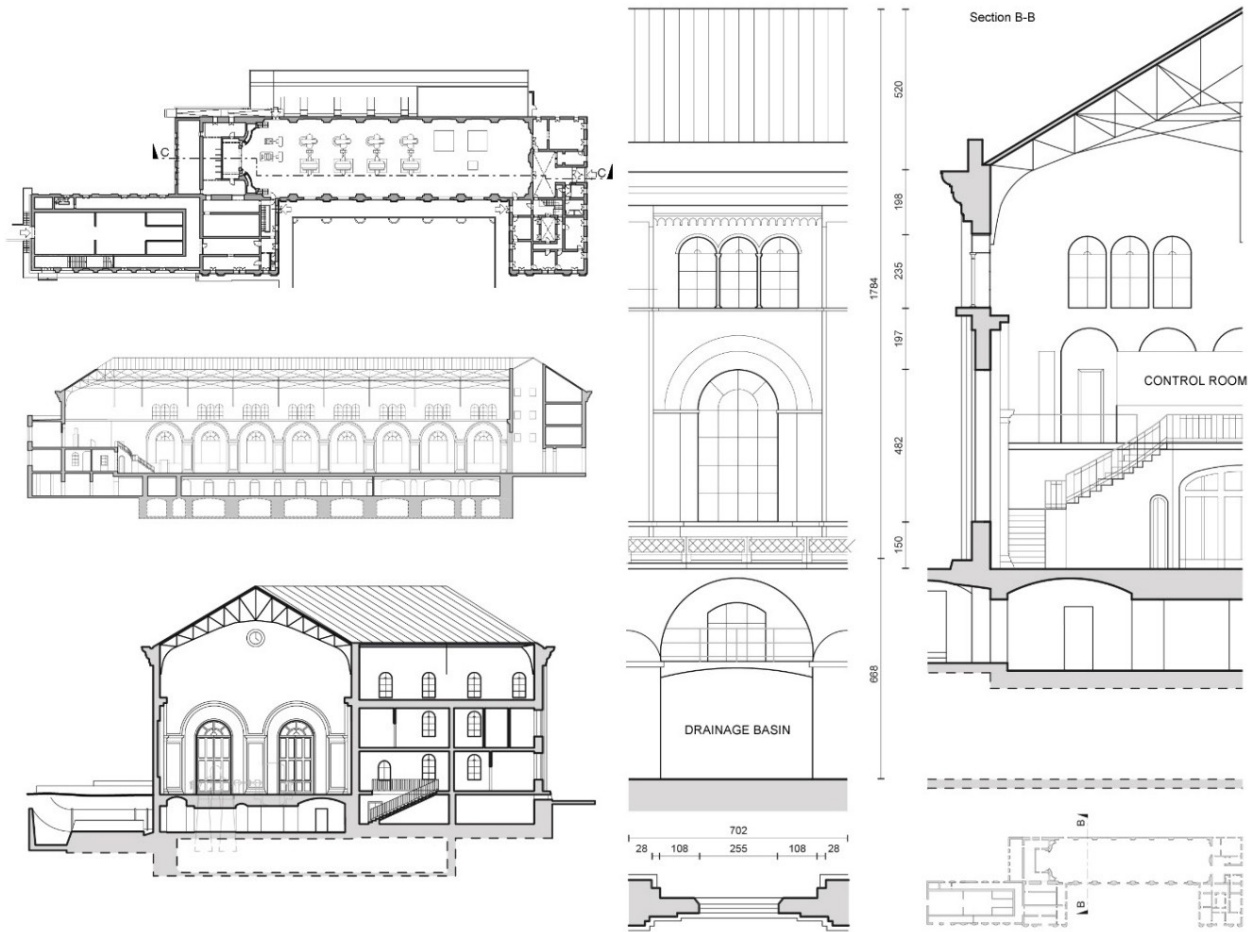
Antonio Pitter power plant (Malnisio). Left from de bottom: second level plan, longitudinal section of the main building, cross-section. Right: architectural layout of southern elevation and section B-B © F. Chinellato, L. Petriccione.
